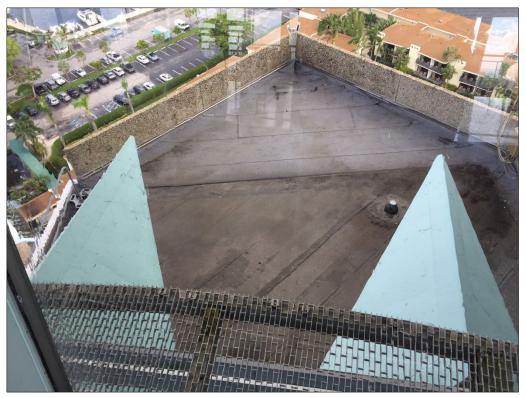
Pier 66 Hotel Tower. Trihedrons. Camera facing down and northwest. Photograph taken October, 2017.
